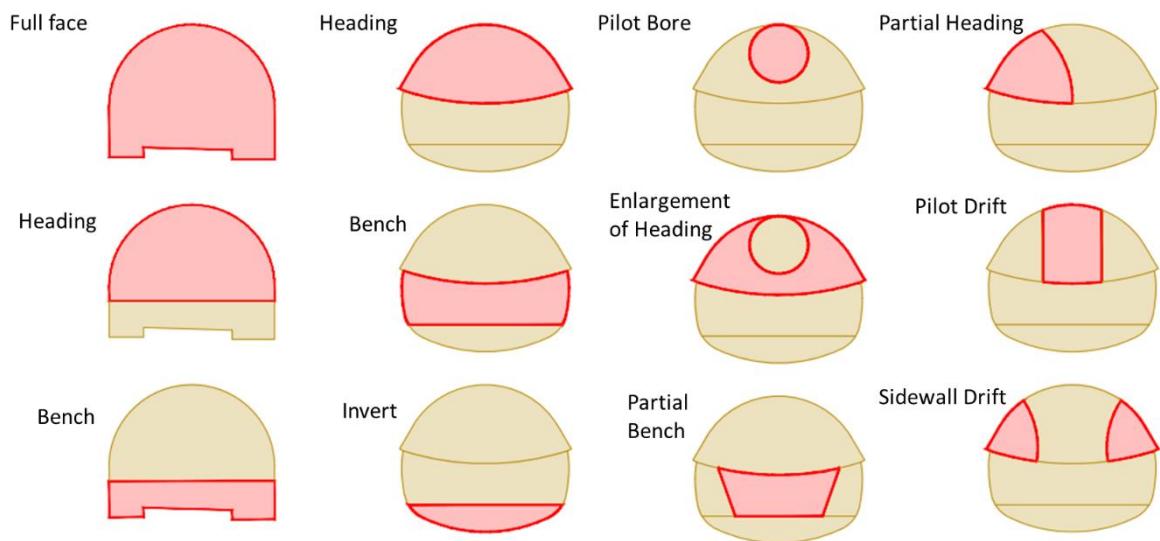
Typical excavation stages of conventional tunnelling (source SBB/ILF)
